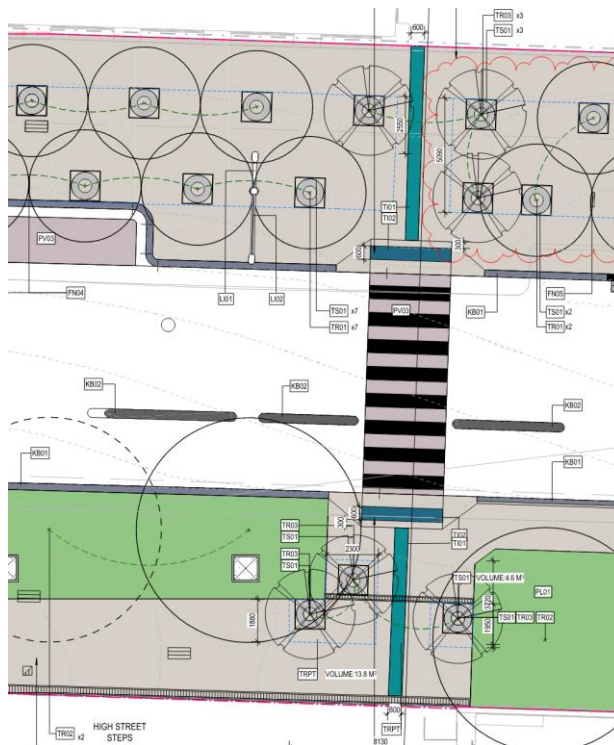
Plan of new Hickson Road pedestrian crossing to Barangaroo Central
